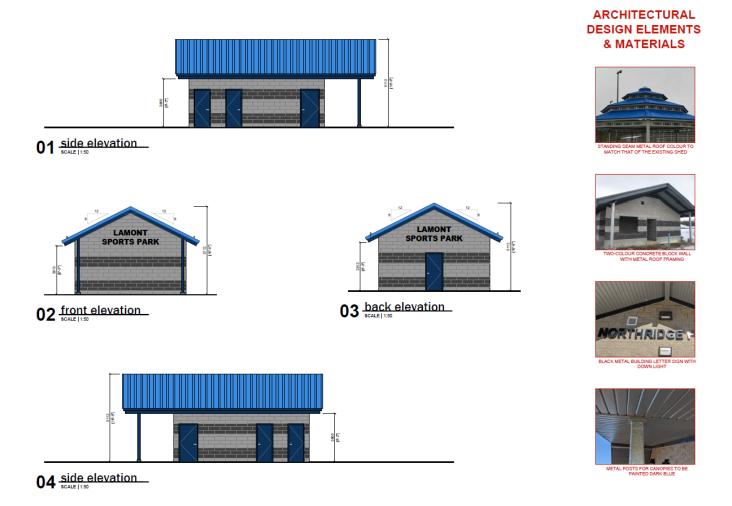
Architectural Design Elements, Block Washroom Design, Elevation View
